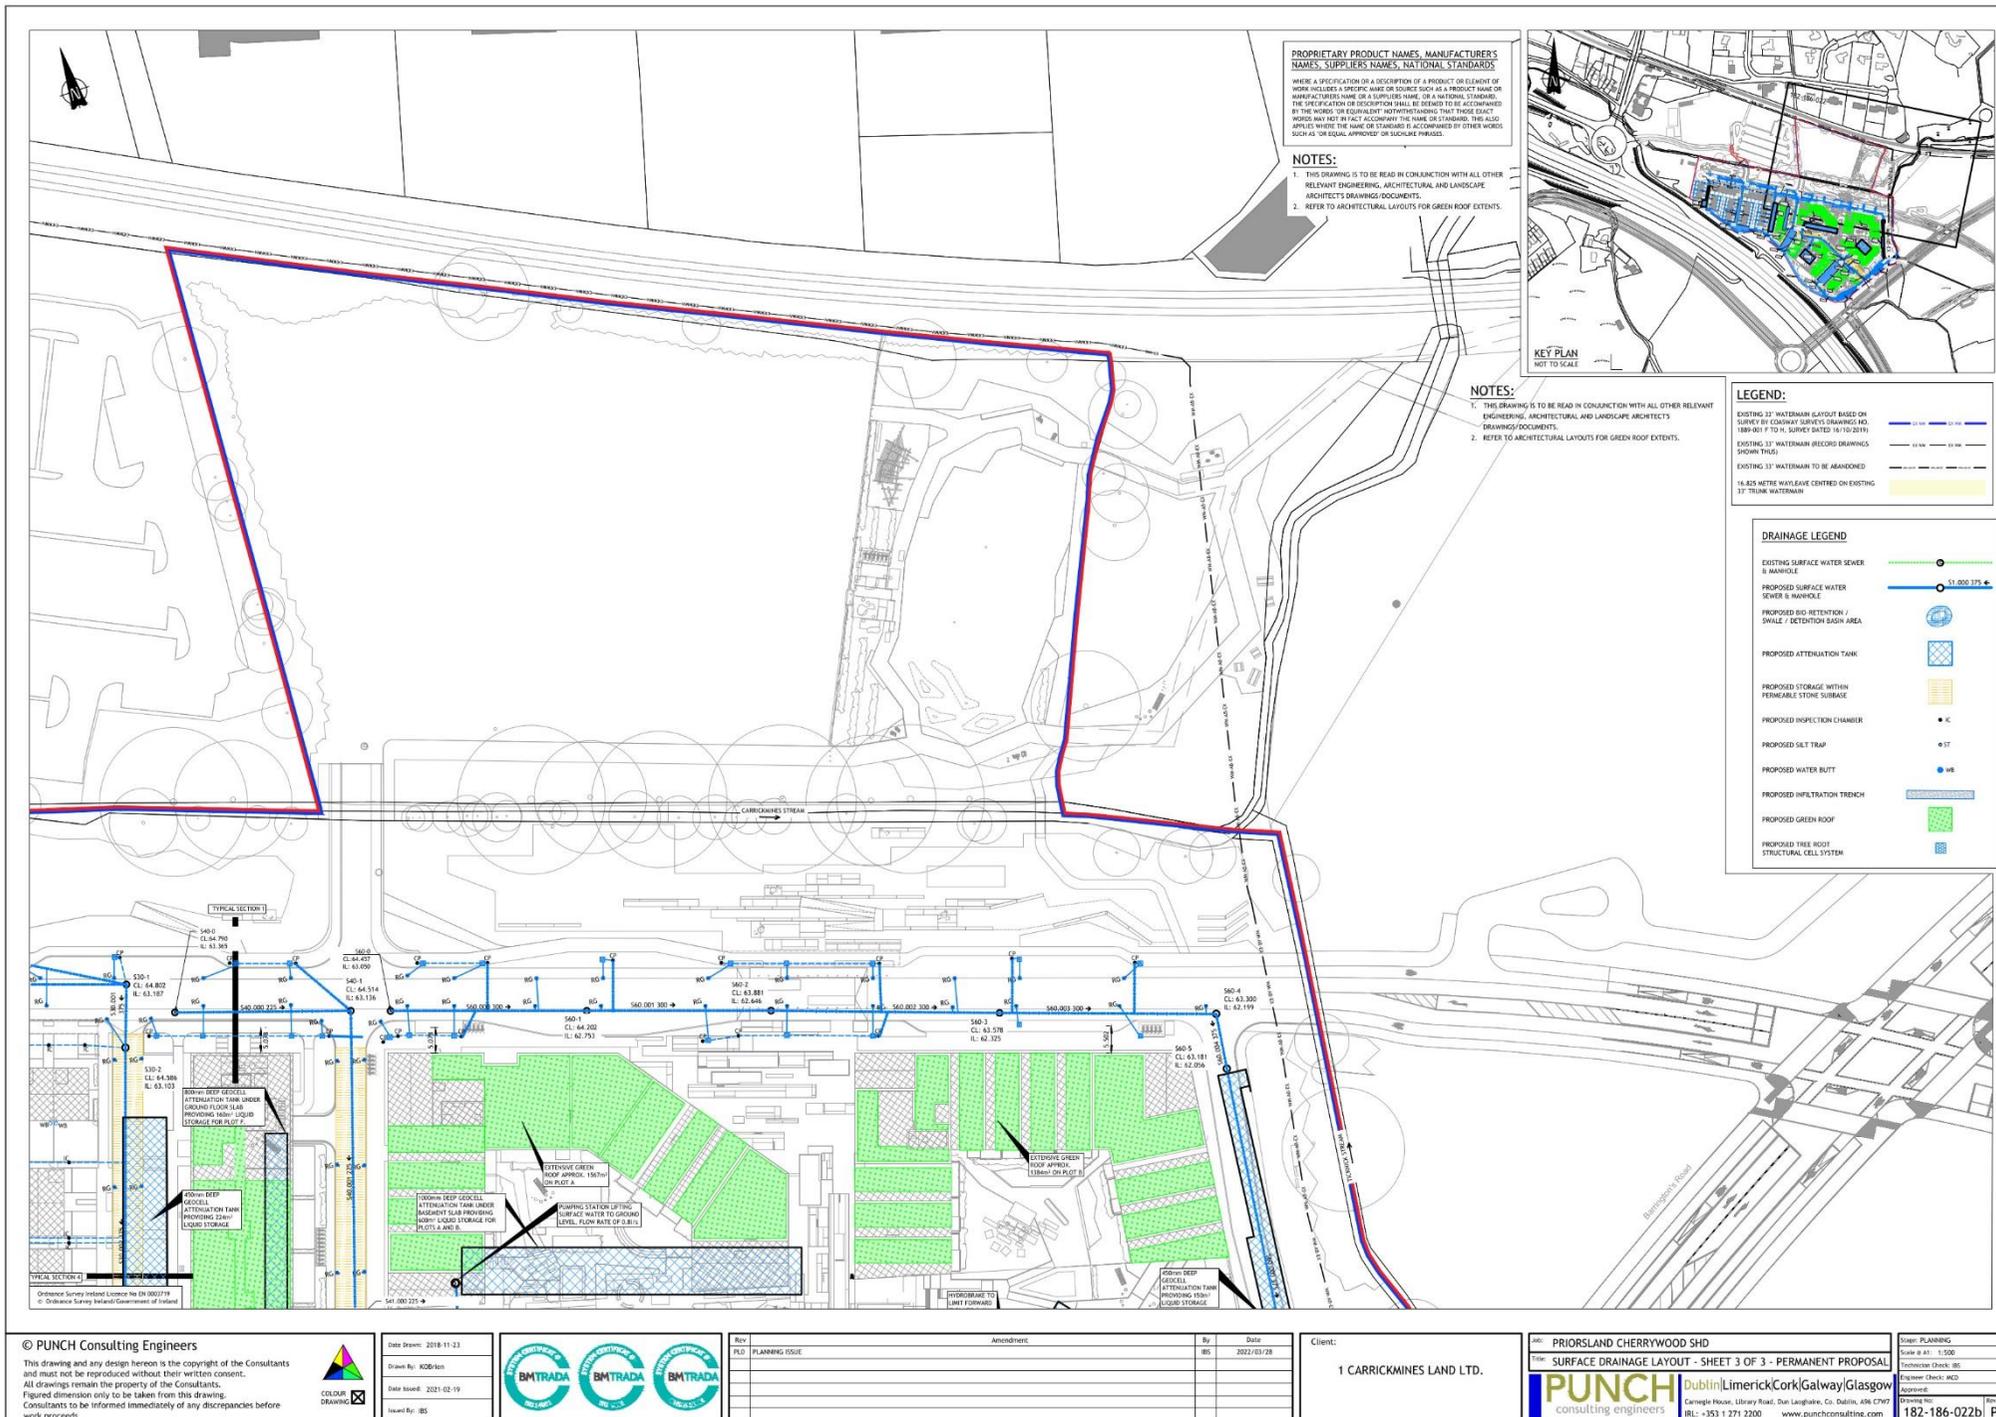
Surface water drainage – Permanent Proposal (sheet 3)
